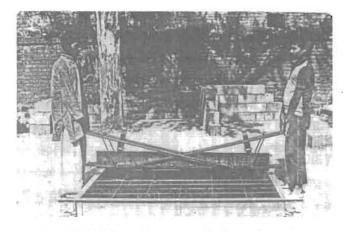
Demoulding with removal of metalic strips using auto-grip scissor clamps.
